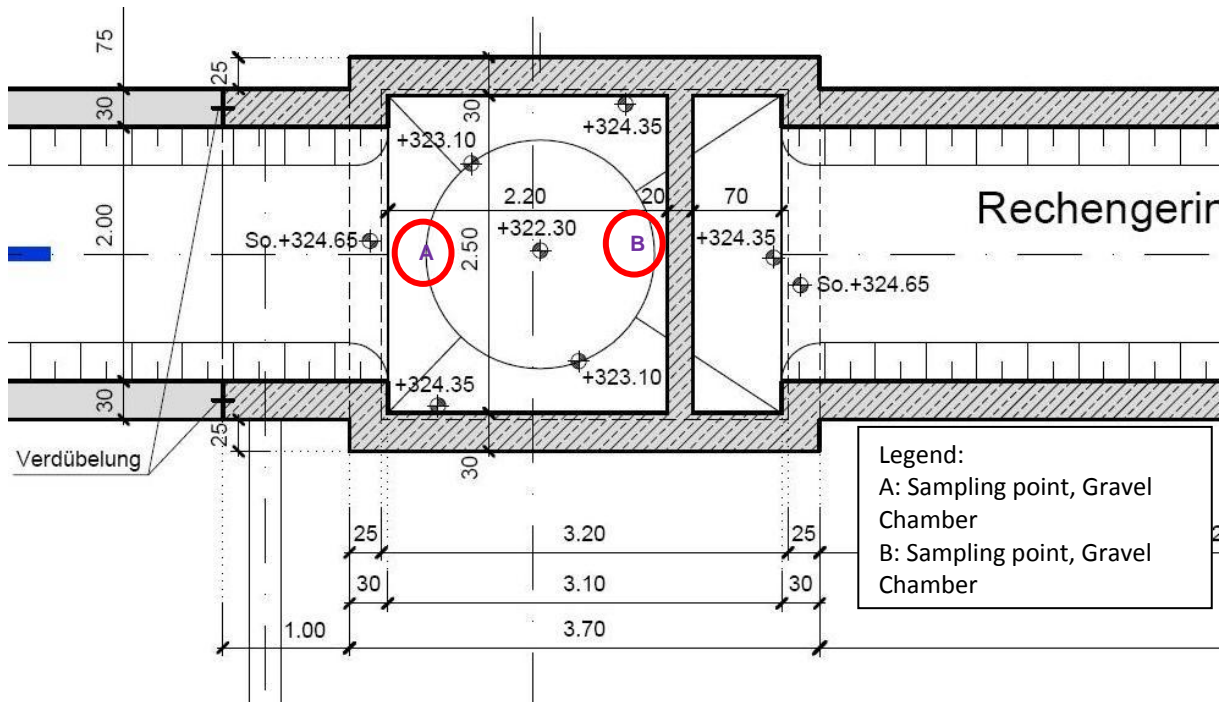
Layout plan of Sampling site Gravel Chamber
